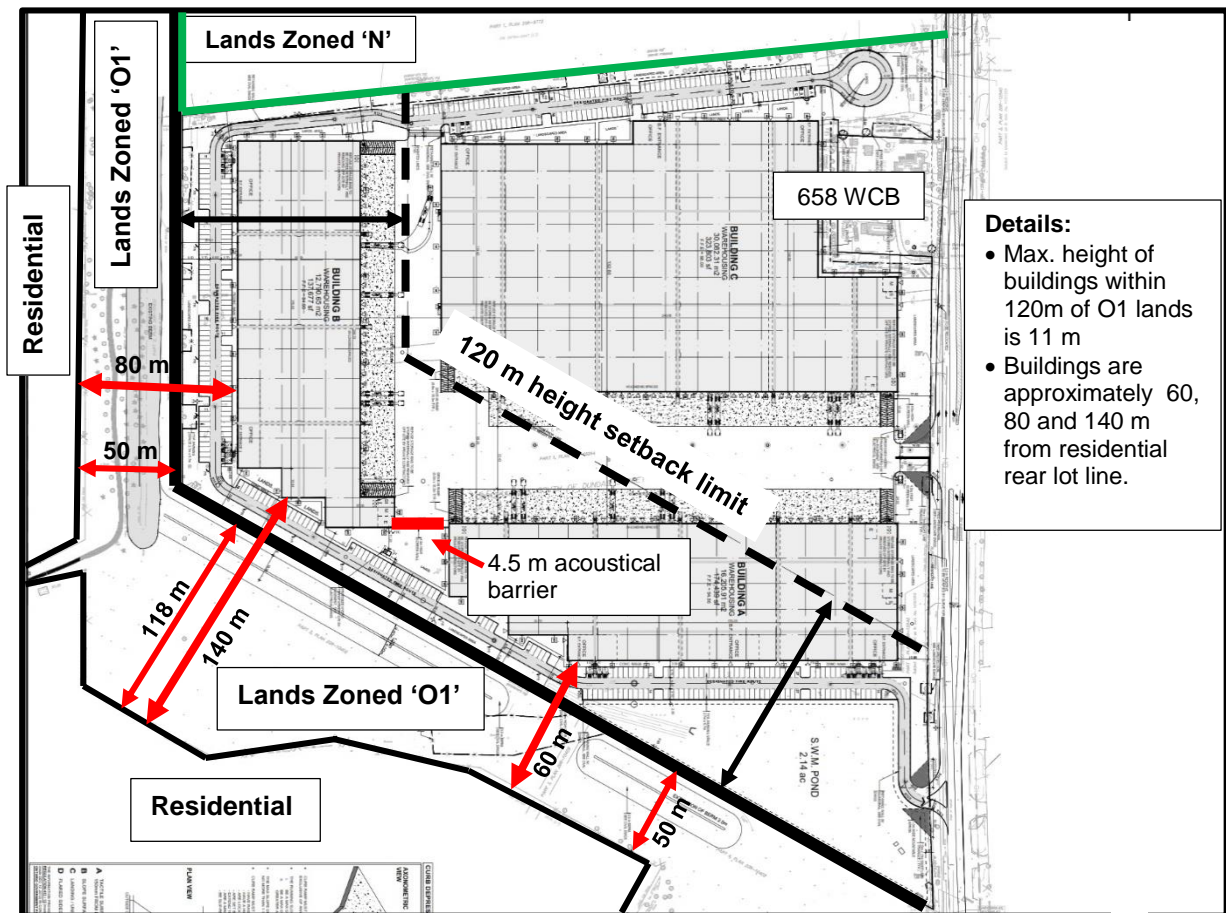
Separation distances between proposed buildings and lands zoned for residential uses
